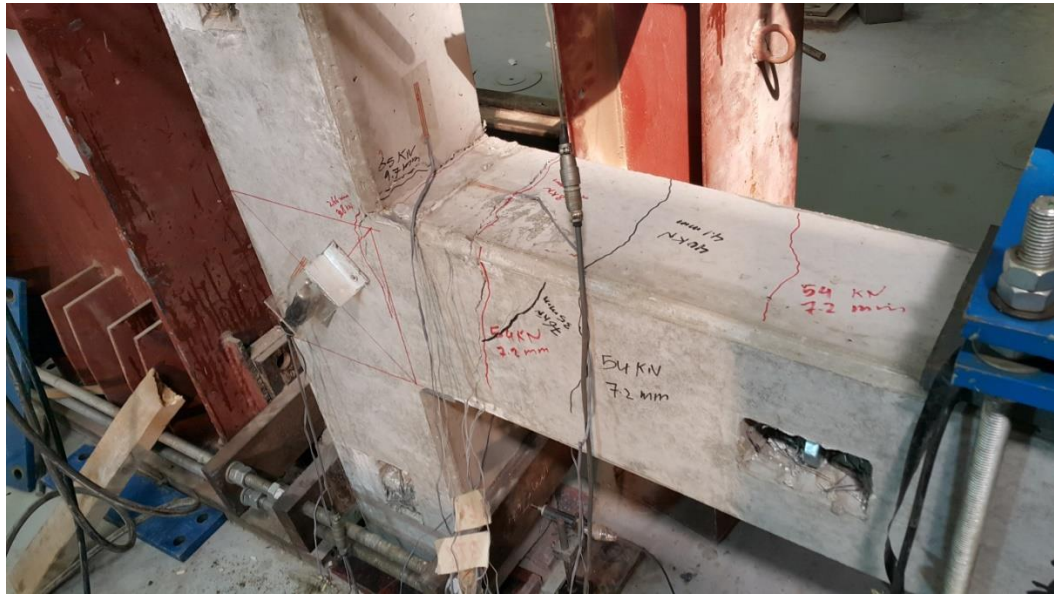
2: The formation of cracks for Con-BCJ-1 specimen
